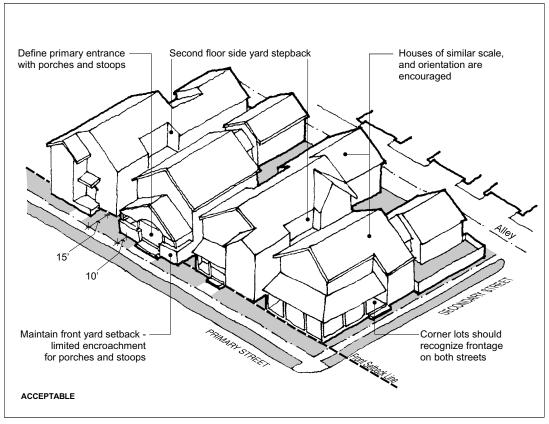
Single-Family District - Building Orientation and Front Yard Conditions
